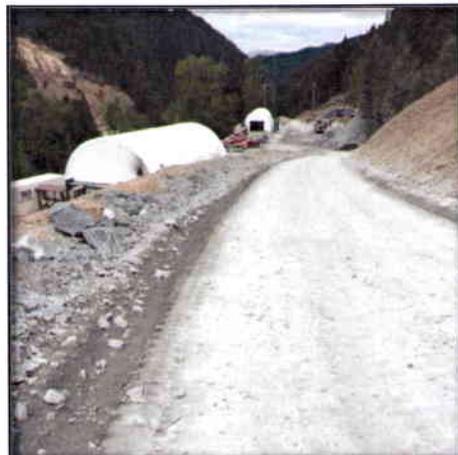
Waste Rock Utilized to Improve Road Surfaces
